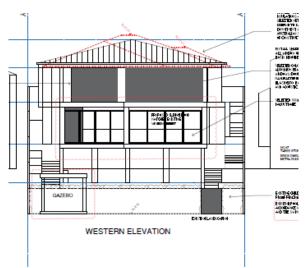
Proposed western elevation plan (existing building outline shown in red)
